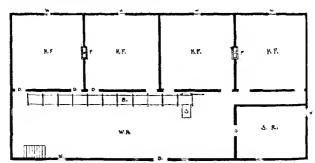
Fig. VII .- Four-kiln Evaporator, Second Story Plan.
